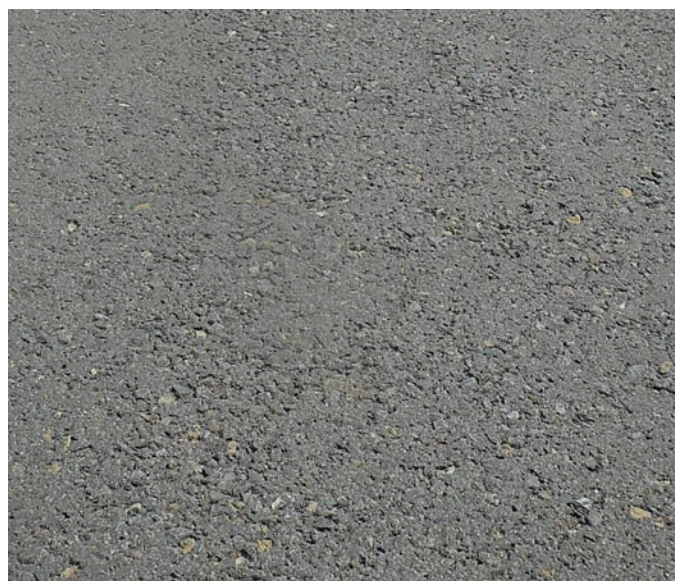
WMA surface texture in Walla Walla, Washington, at 13-month inspection.
